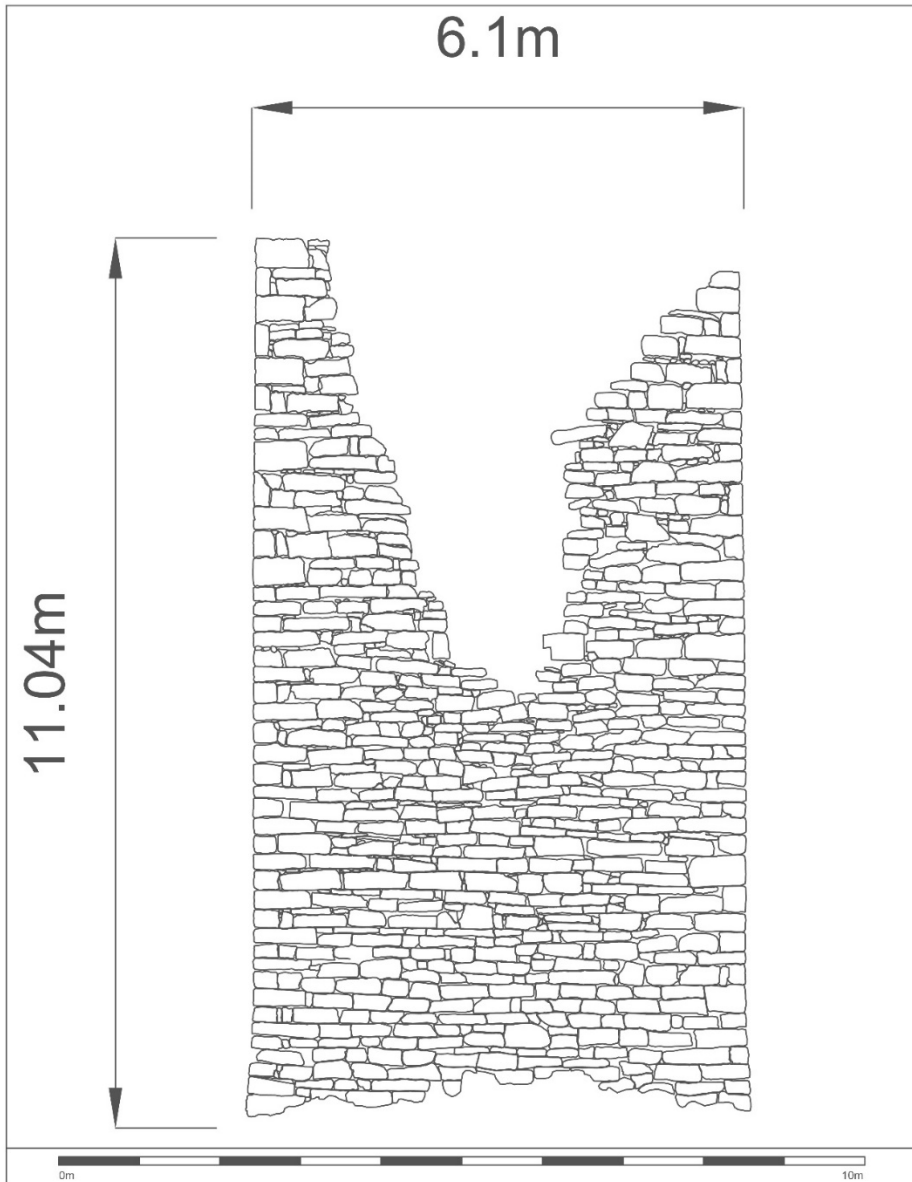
External elevation of the west all the signal tower at Glash Signal Station.
